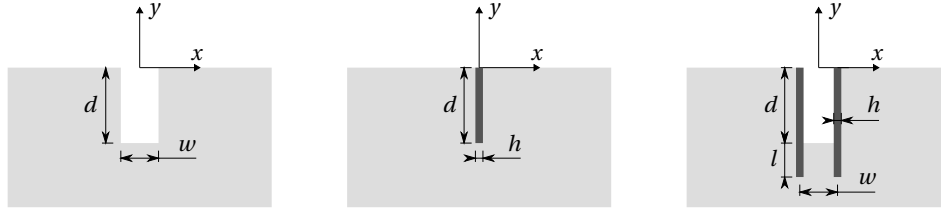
Problems layout. Left: open trench. Center: simple wall. Right: open trench-wall.
